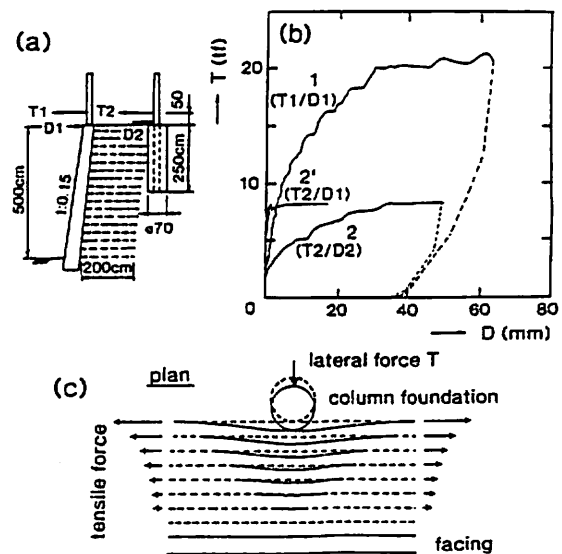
Lateral loading tests of the foundation either fixed on the top of the facing (case ①) or placed immediately behind the reinforced zone (case ②) in a GRS-RW with a sand backfill: (a) test configurations, (b) the relationships between the lateral load T and the horizontal displacement D , and (c) schematic diagram showing the deformation of grid in the case ② (Tateyama et al., 1992a, Tamura et al., 1992).
